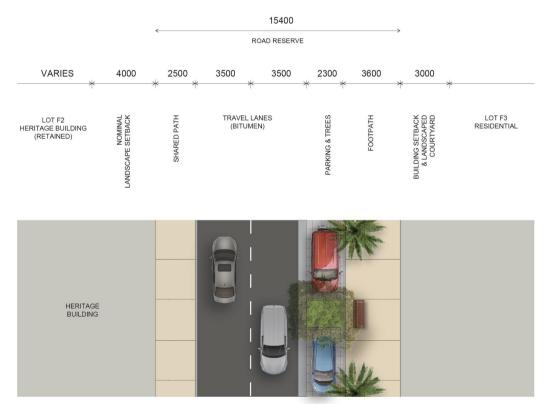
Typical street section 7 - East Circuit (west)
